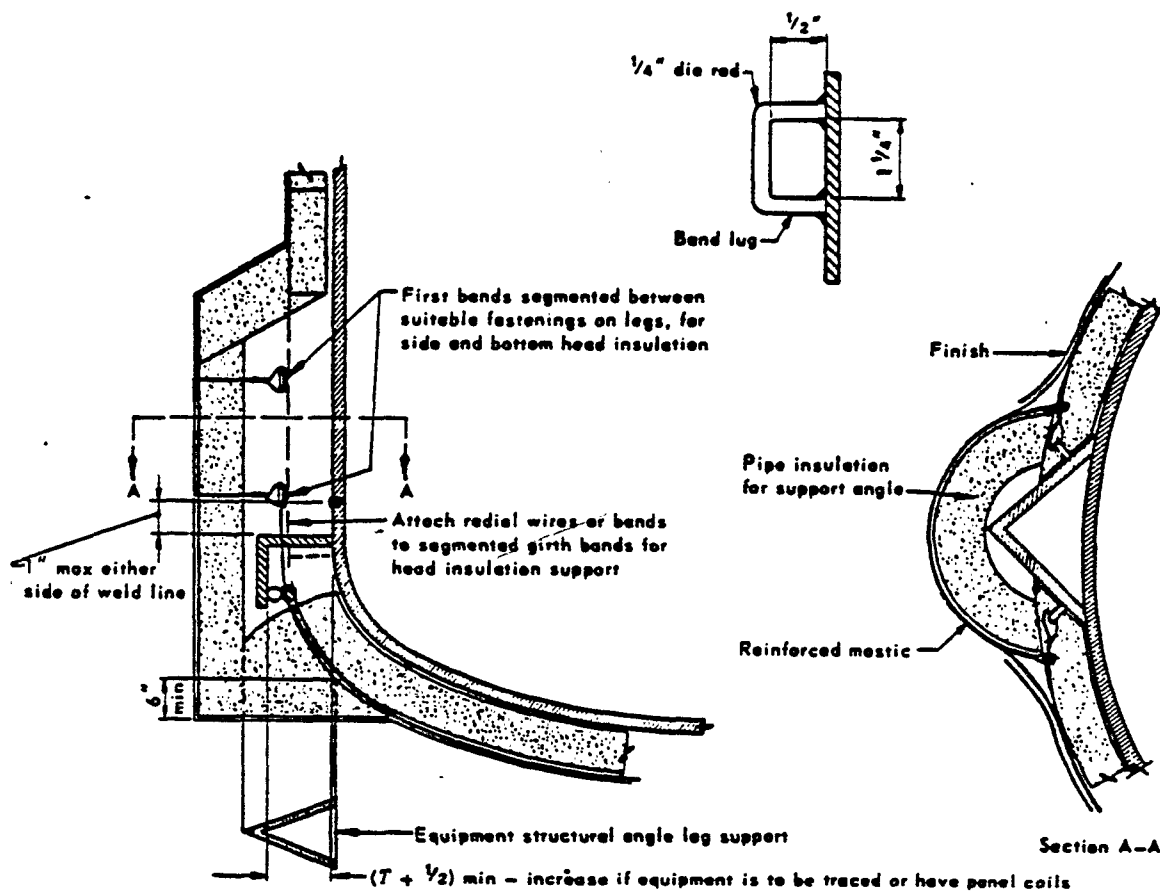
VERTICAL CYLINDRICAL EQUIPMENT WITH STRUCTURAL ANGLE LEG SUPPORTS
